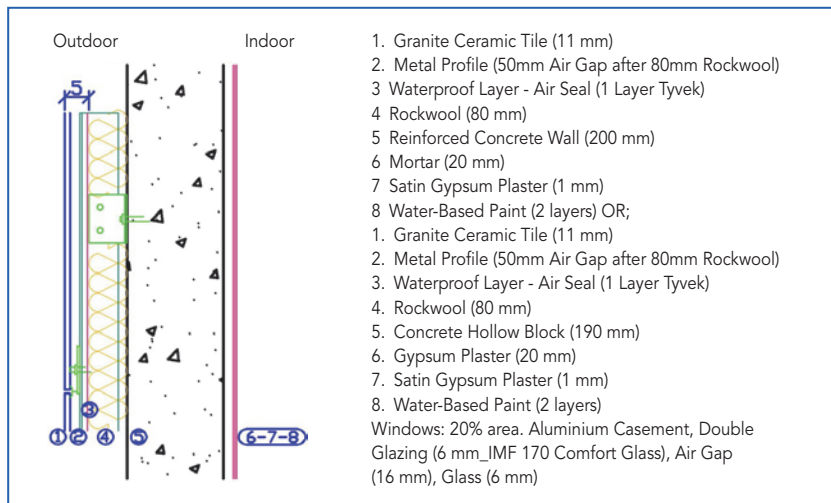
A sample external wall detail in a new residential building [1, 2].
